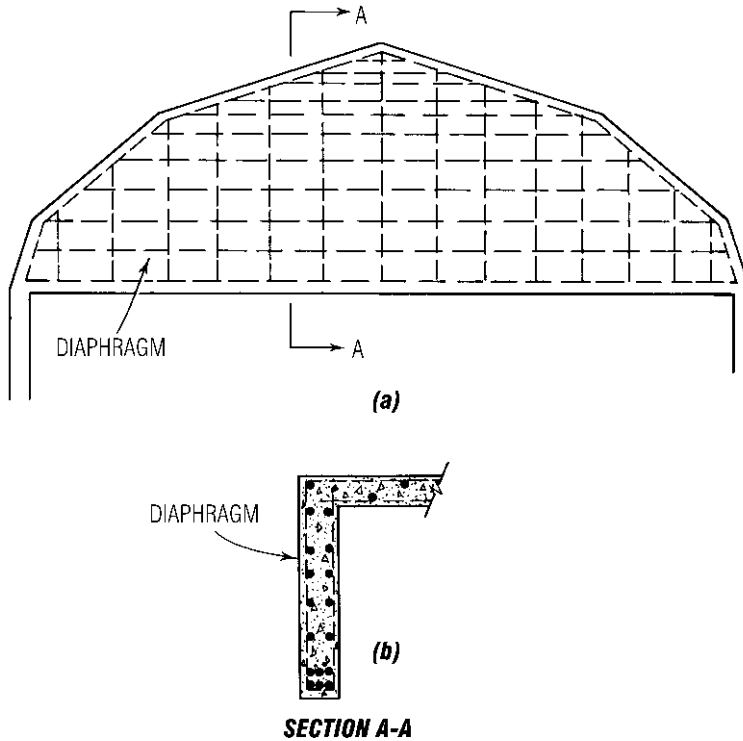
Reinforcement in the diaphragm of a folded-plate roof.
